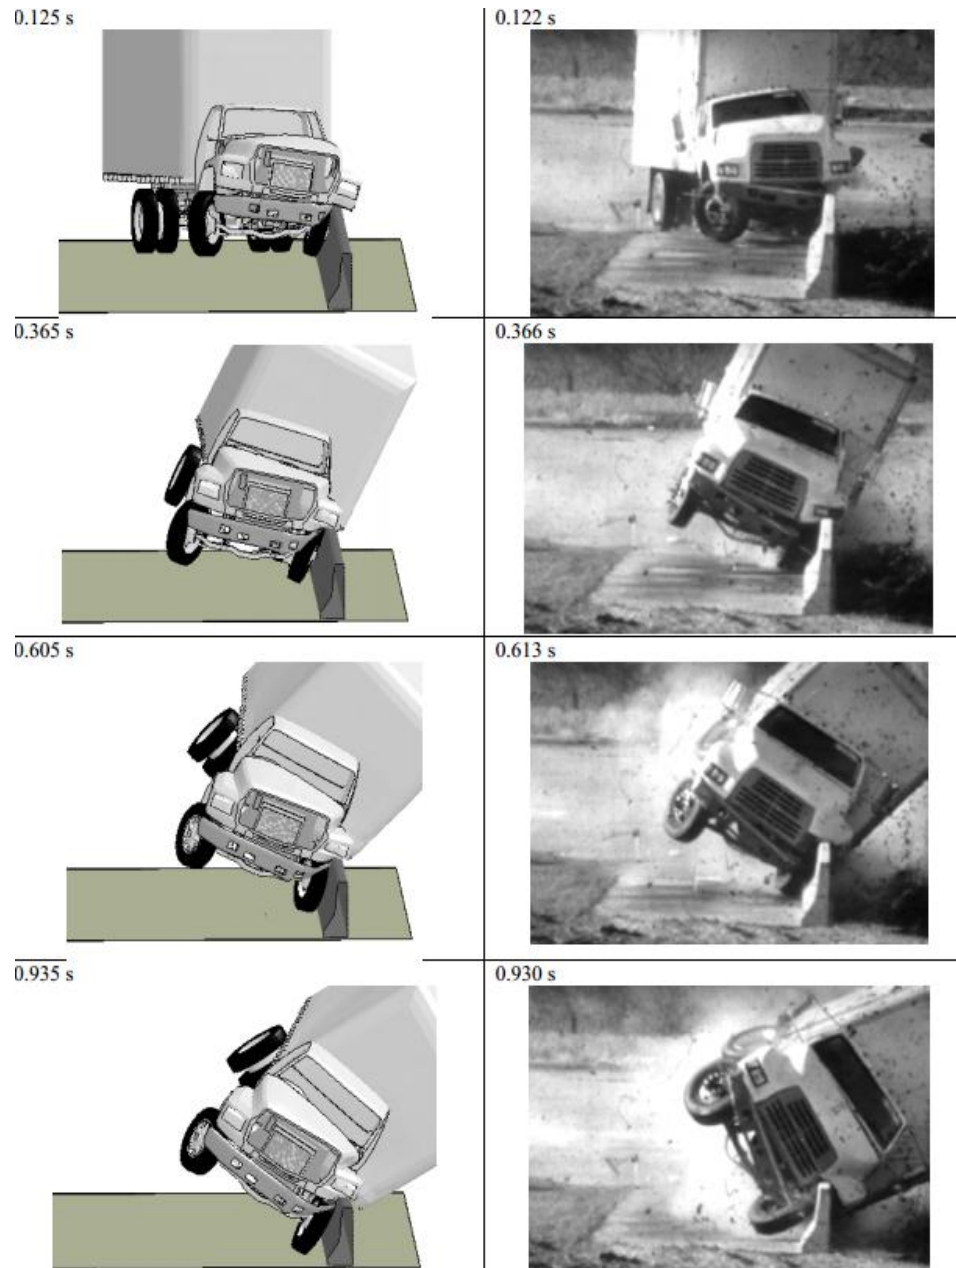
Test Level 4 – Single Unit Truck (After Sheikh Nauman M., Determination of Minimum Height and Lateral Design Load for Mash Test Level 4 Bridge Rails, 2011)
